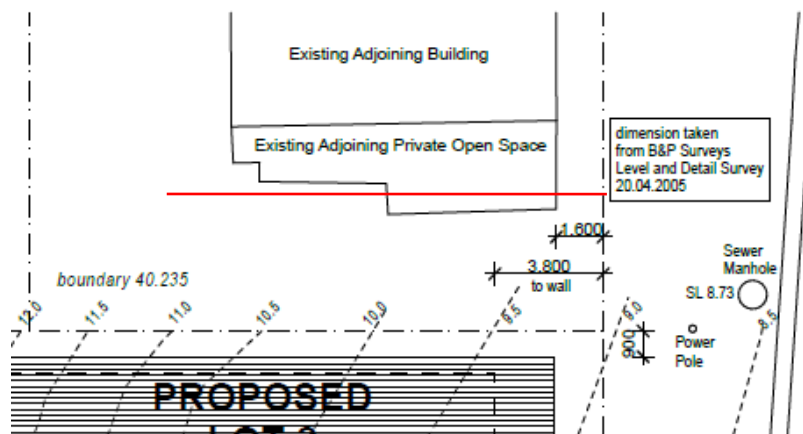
excerpt from Site Plan WD 0.03 Rev C – adjoining existing development at 42 Queen Street
